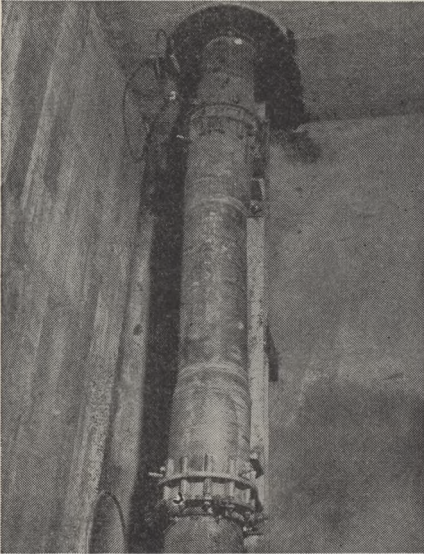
Expansion Joints in Manhole with Anchor Bases Bolted to Structural Steel Channel
